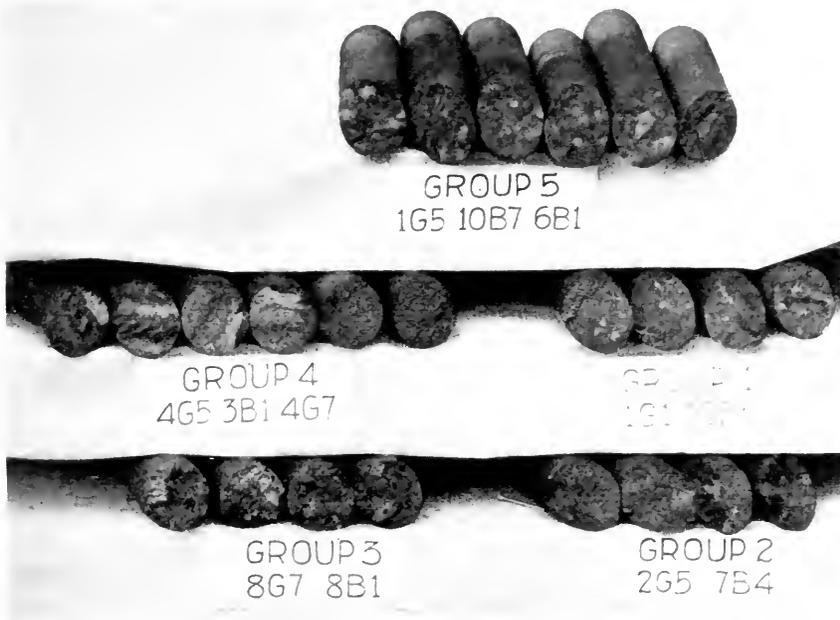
Typical Fractures of Tensile Specimens arranged in groups
